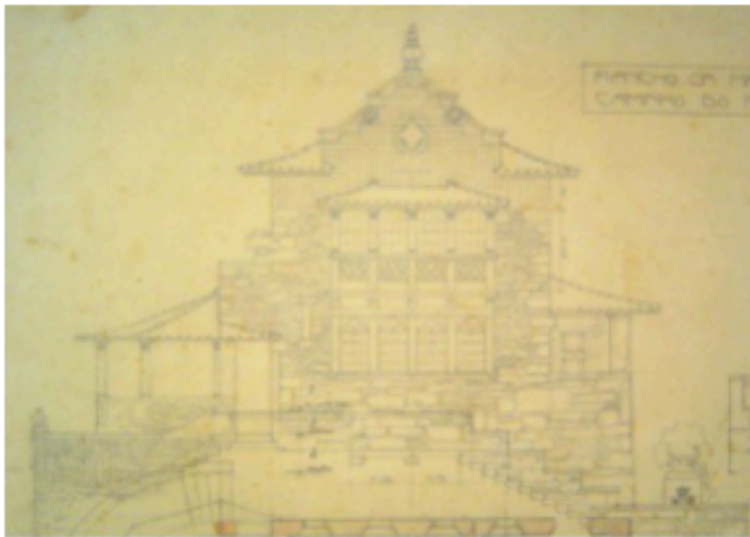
Project of Victor Dubugras (Archive Library FAU-USP) Elevation Plan. Photo Mariane Ginesi.
